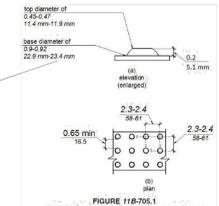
B-705.1 SIZE AND SPACING OF TRUNCATED DOMES
